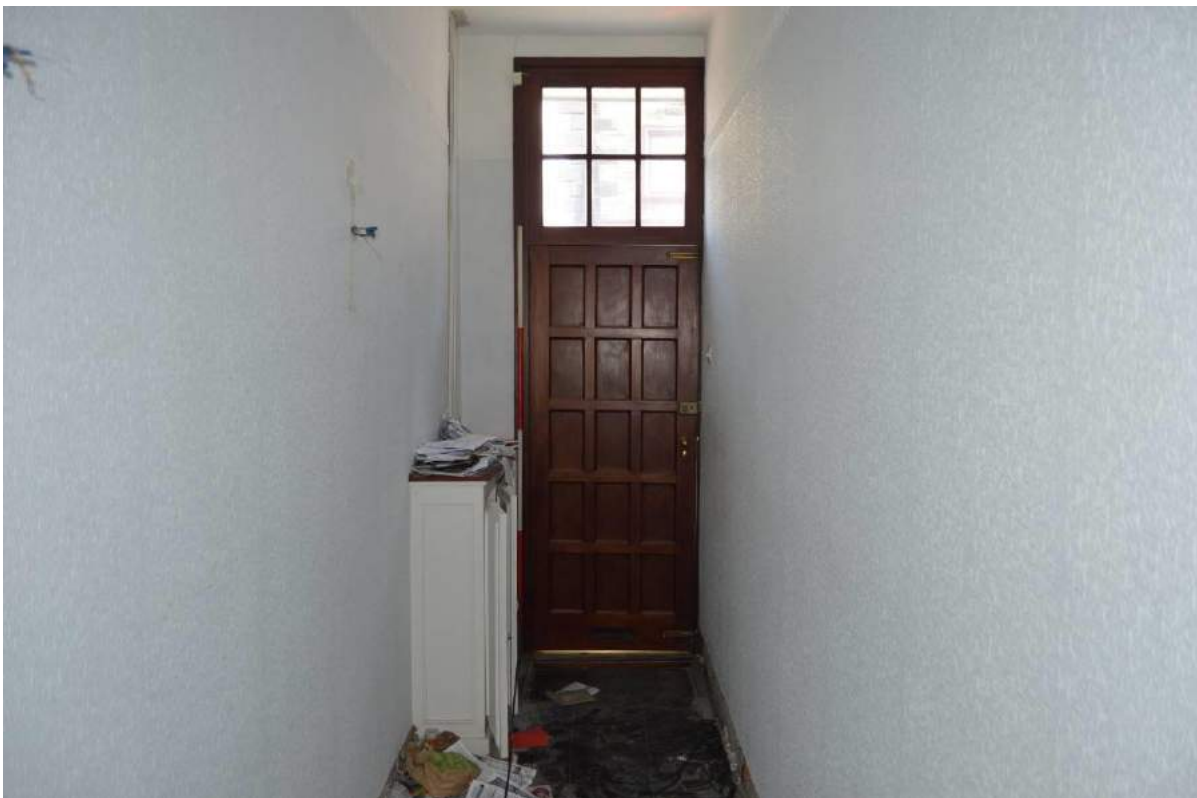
Door leading from the street into the domestic area of the building (Scale: 1 x 2m).
